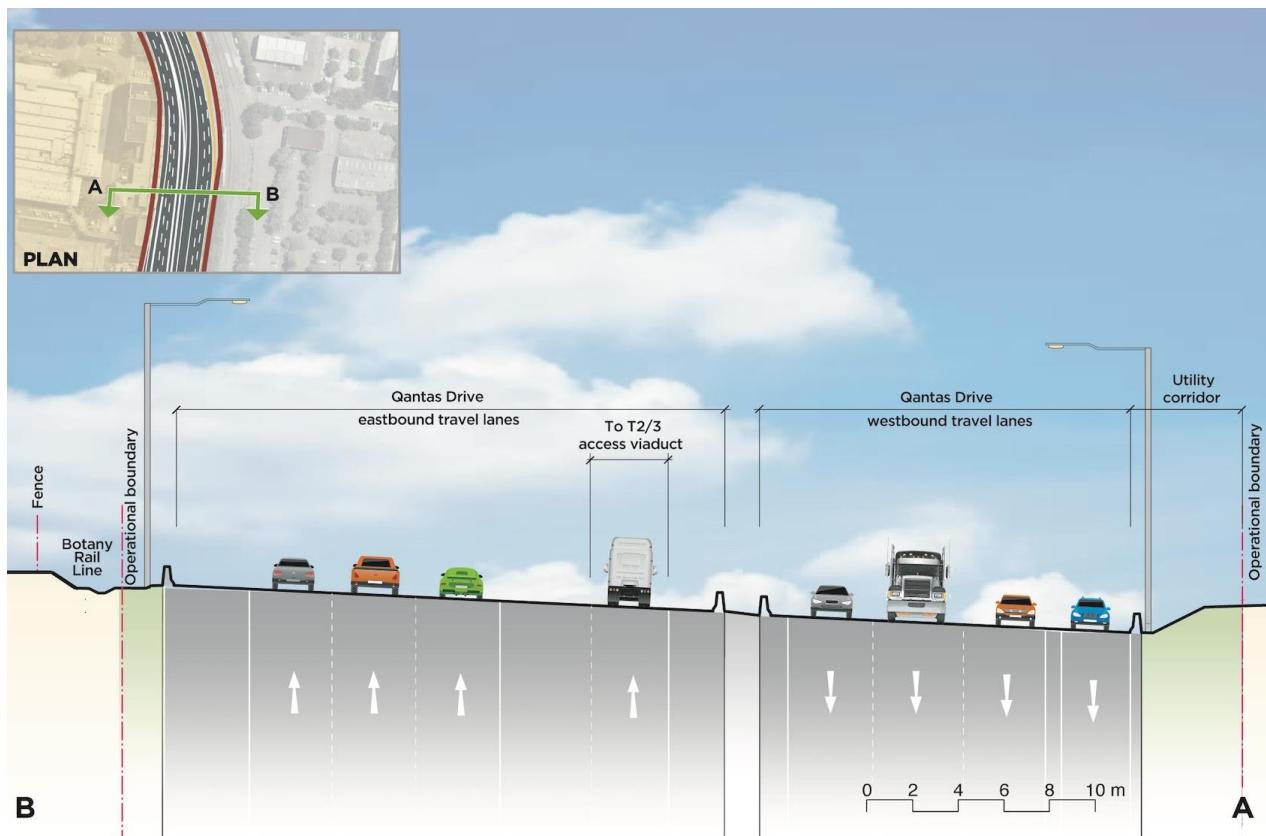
Qantas Drive upgrade and extension between King Street and Ewan Street – typical cross-section (looking south)
